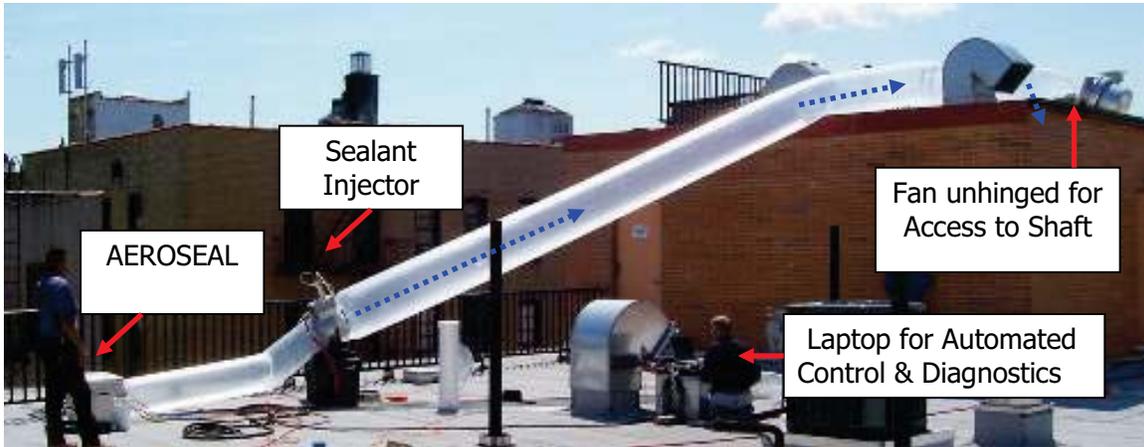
AEROSEAL installation set-up on roof a demonstration building.
